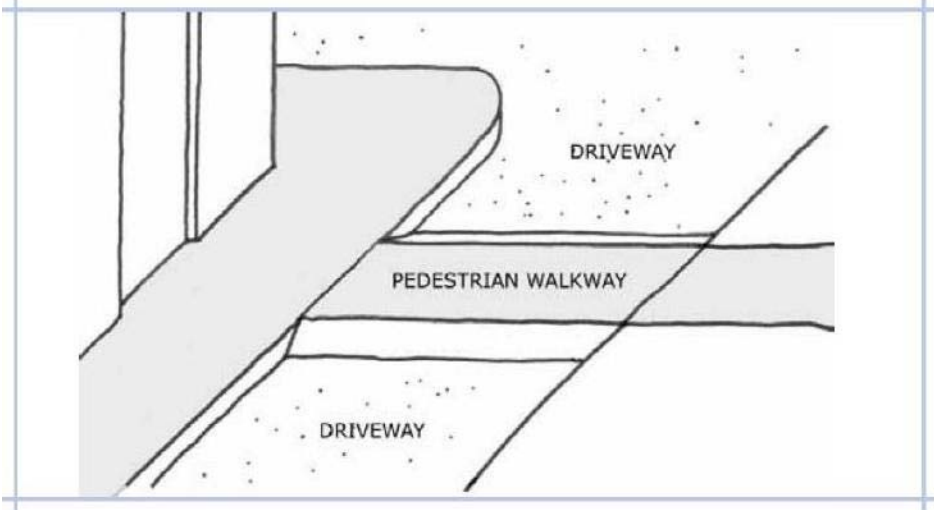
Example of a pedestrian walkway through a drive-through lane. The walkway shall be constructed using distinctive stamped asphalt or concrete.
